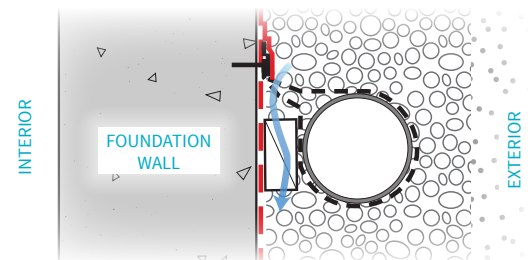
Improved drain pipe support options, with drainage allowed behind the pipe through blocking or drain mat (section view).
